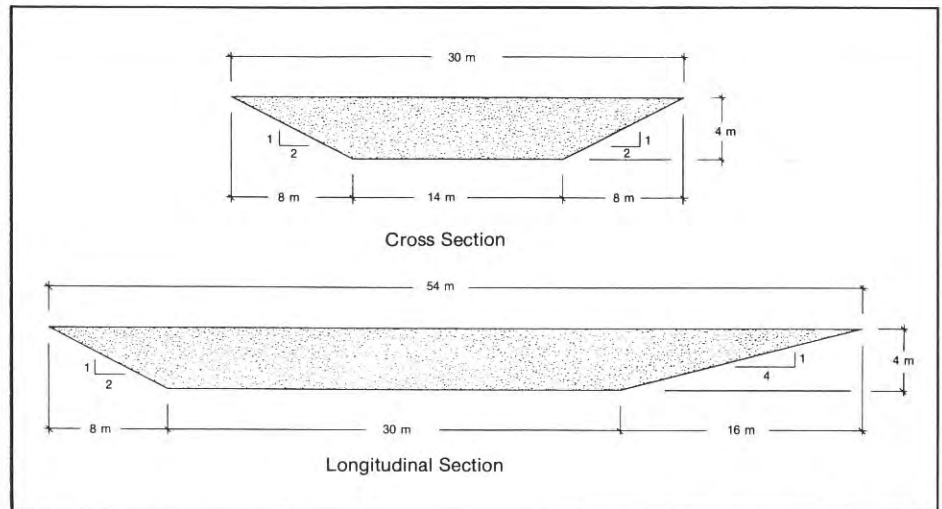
TYPICAL SECTIONS FOR EXCAVATED PONDS
